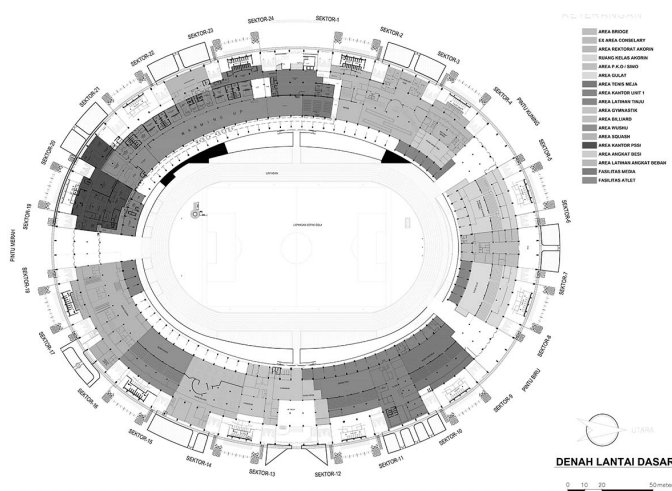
The floor plan of main stadium after re-draw by Building Information Model (BIM) (Source: State Secretary of Indonesia, 2018).
